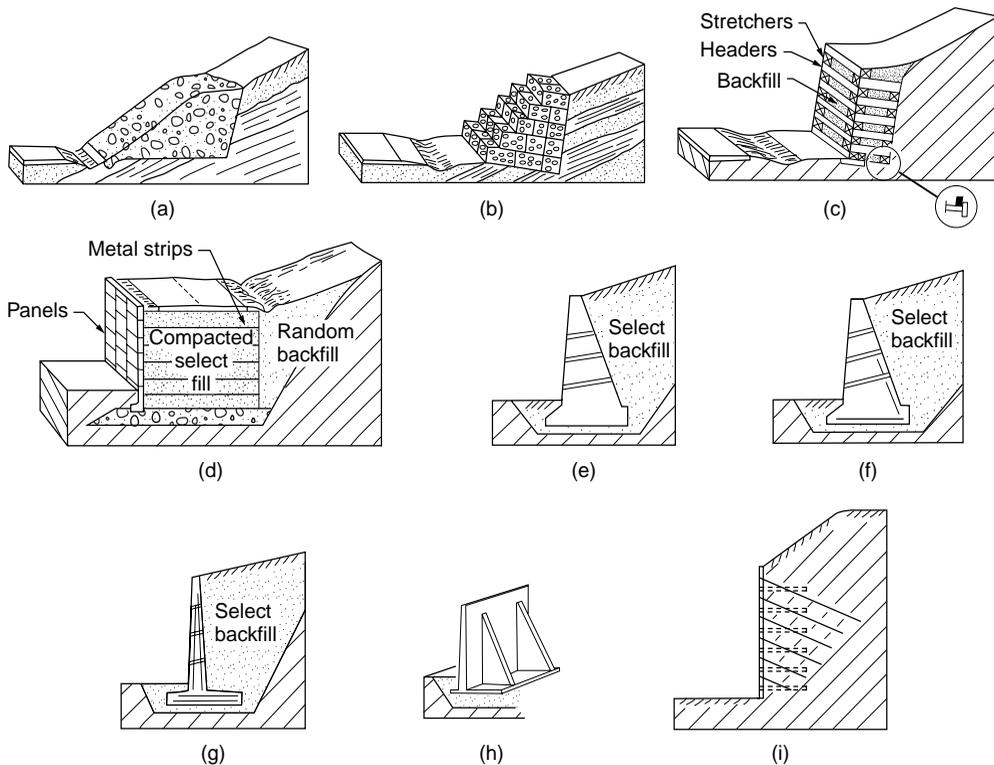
Various types of retaining walls: (a) rock-filled buttress; (b) gabion wall; (c) crib wall; (d) reinforced earth wall; (e) concrete gravity wall; (f) concrete-reinforced semigravity wall; (g) cantilever wall; (h) counterfort wall; (i) anchored curtain wall. (Source: Hunt, R. E. 1986. *Geotechnical Engineering Techniques and Practices*. McGraw-Hill, New York. Reprinted with permission of McGraw-Hill Book Co.)
